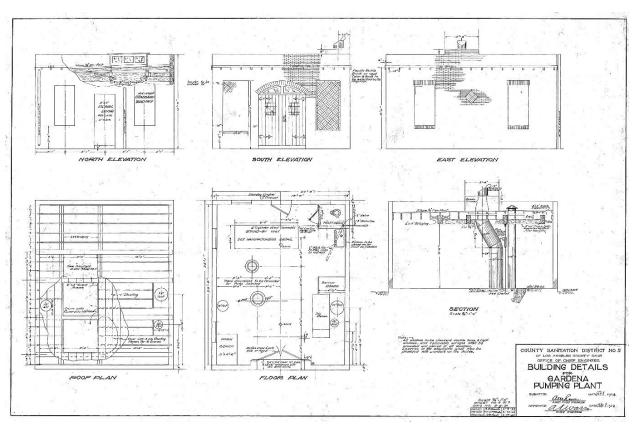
Sheet 5. Building Details for Gardena Pumping Plant, 1928 by A M Rawn (LACSD Records)
